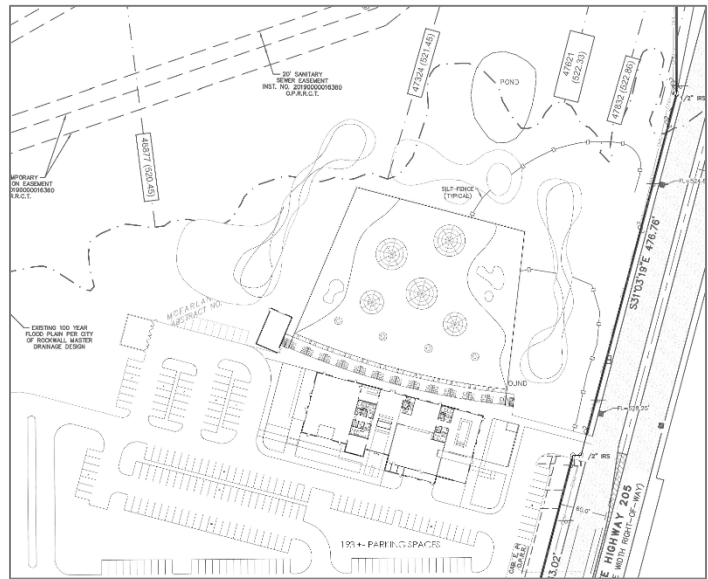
CONCEPT PLAN FOR THE FACILITY
